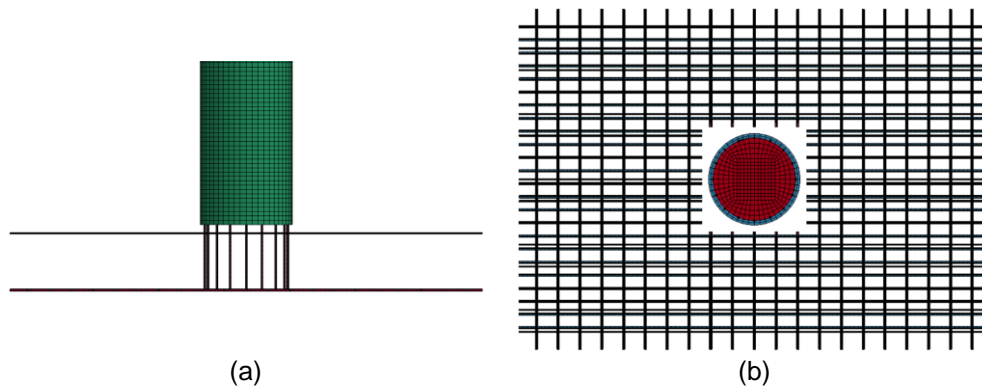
Steel reinforcement details of frame pier's pile cap: (a) side view and (b) top view
